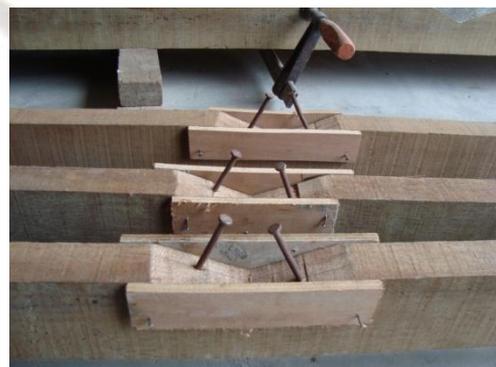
Plywood pieces nailed to the sides of the timber notches
